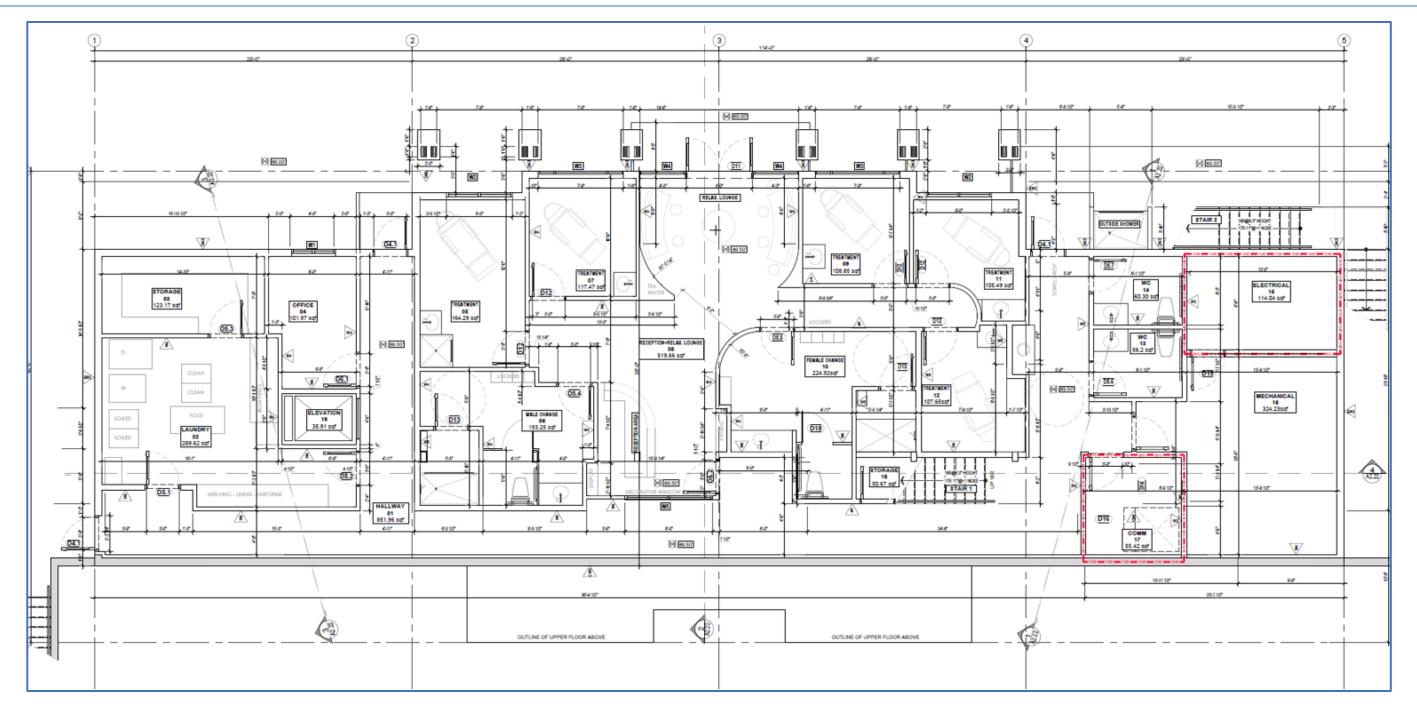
Lower floor of the main building in the *Proposed Development* (refer to Building 1 in Figure 3 for a 3D rendering of the structures). This floor will house a Spa and auxiliary spaces (e.g., electrical, mechanical, laundry and storage rooms). *Image modified from HNPA Architecture+Planning Inc. by Coastal Raintree Consulting, Ltd.
